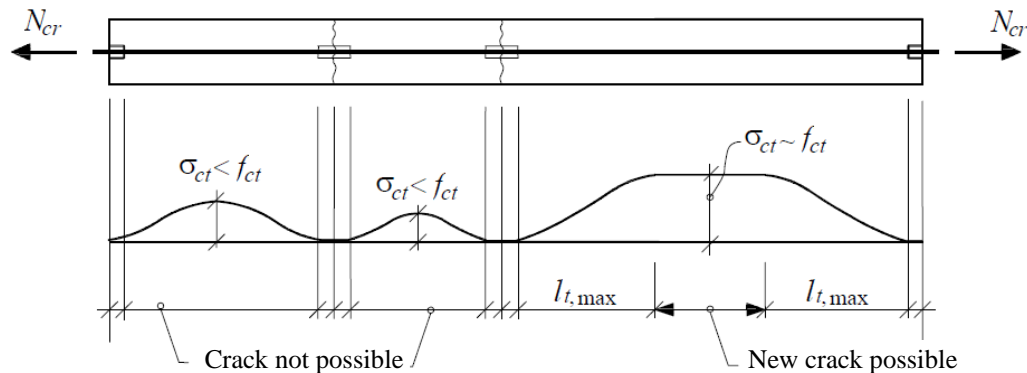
Example of the crack development process in a reinforced concrete prism as well as the distribution of concrete stress as new cracks arise. Figure based on Engström, 2011.
